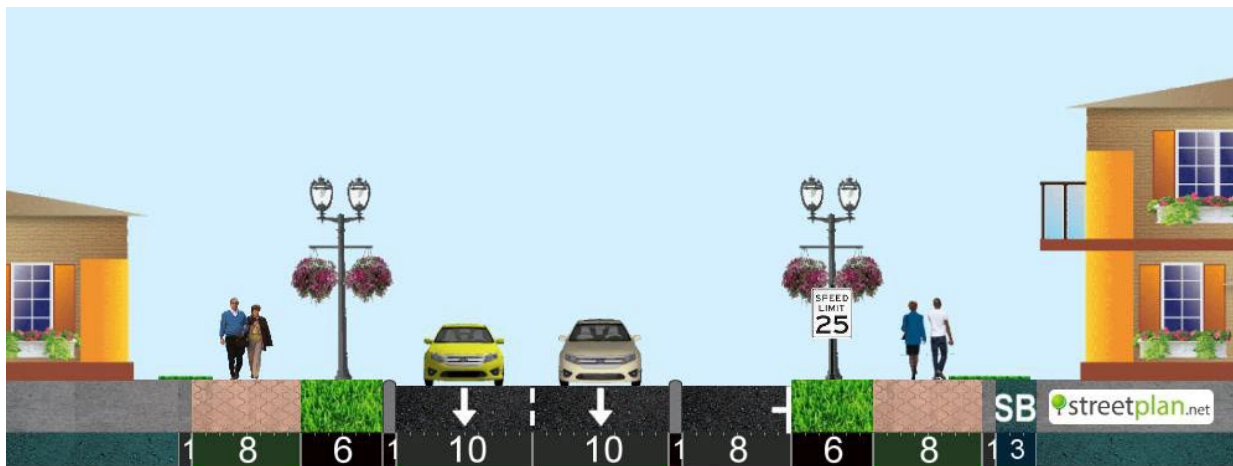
Local Street for Residential with or without a Cul-de-sac
